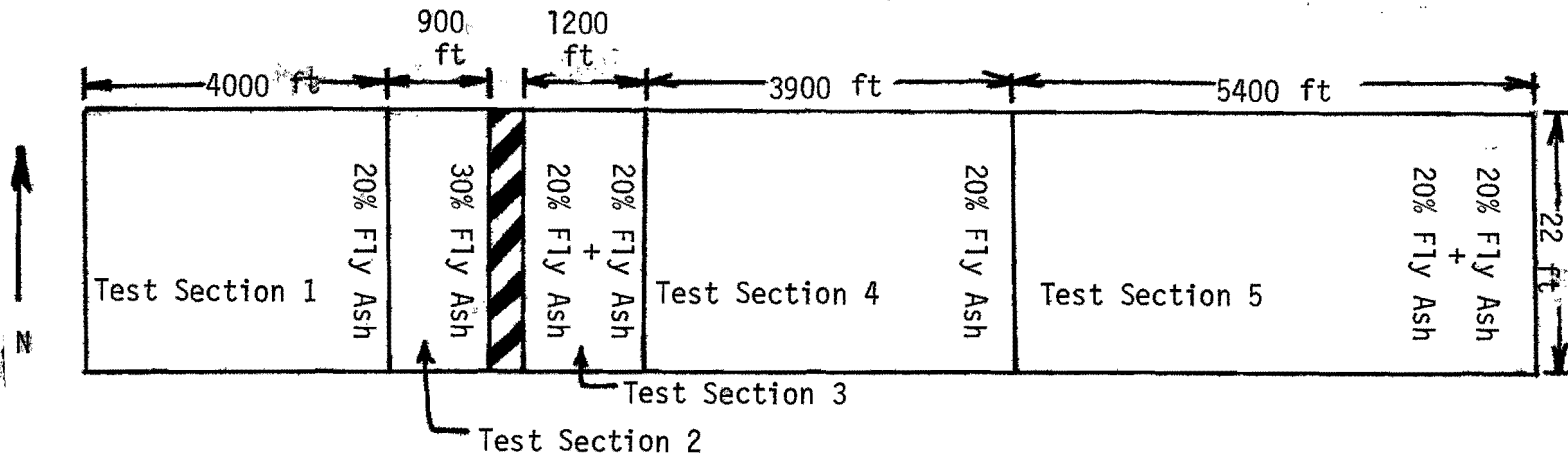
Layout Planview of Test Sections on FM 2697 in Wheeler County, Texas (Test Site No. 12)
